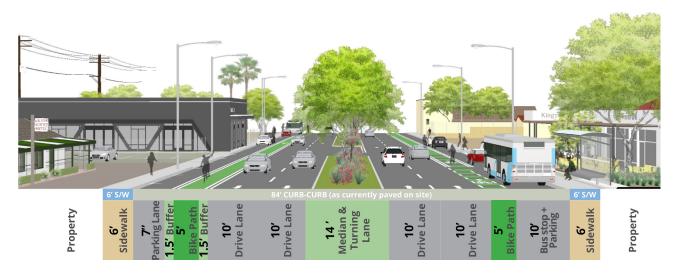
Existing and Proposed Street Design for Cesar Chavez Boulevard
